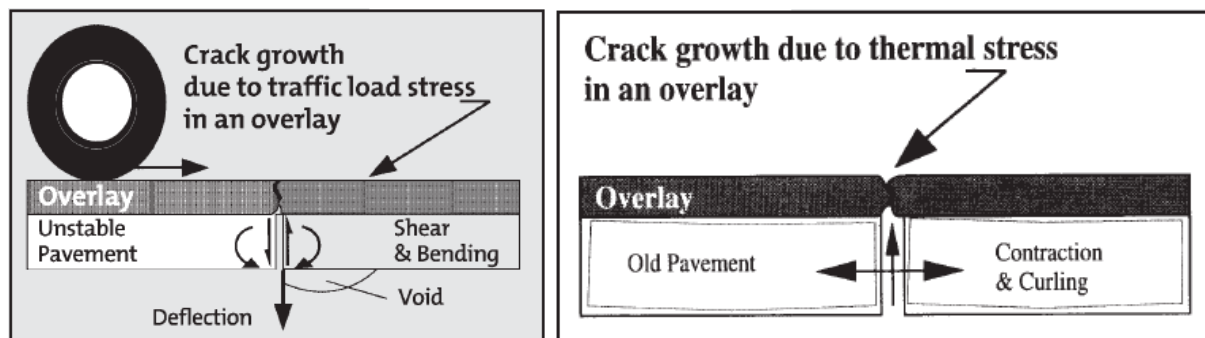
#4: MOVEMENT CAUSED BY TYRE PRESSURE &/OR THERMAL CHANGES IN THE UNDERLYING PAVEMENT, CAUSING REFLECTIVE CRACKING
